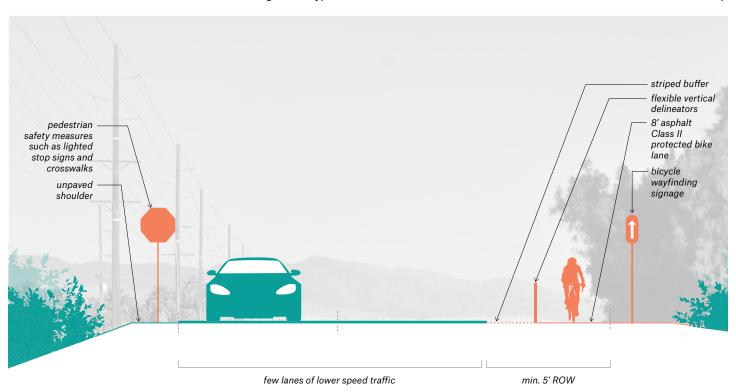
Typical Cross-Section: 8-foot Wide Class II Separated Bike Lane
